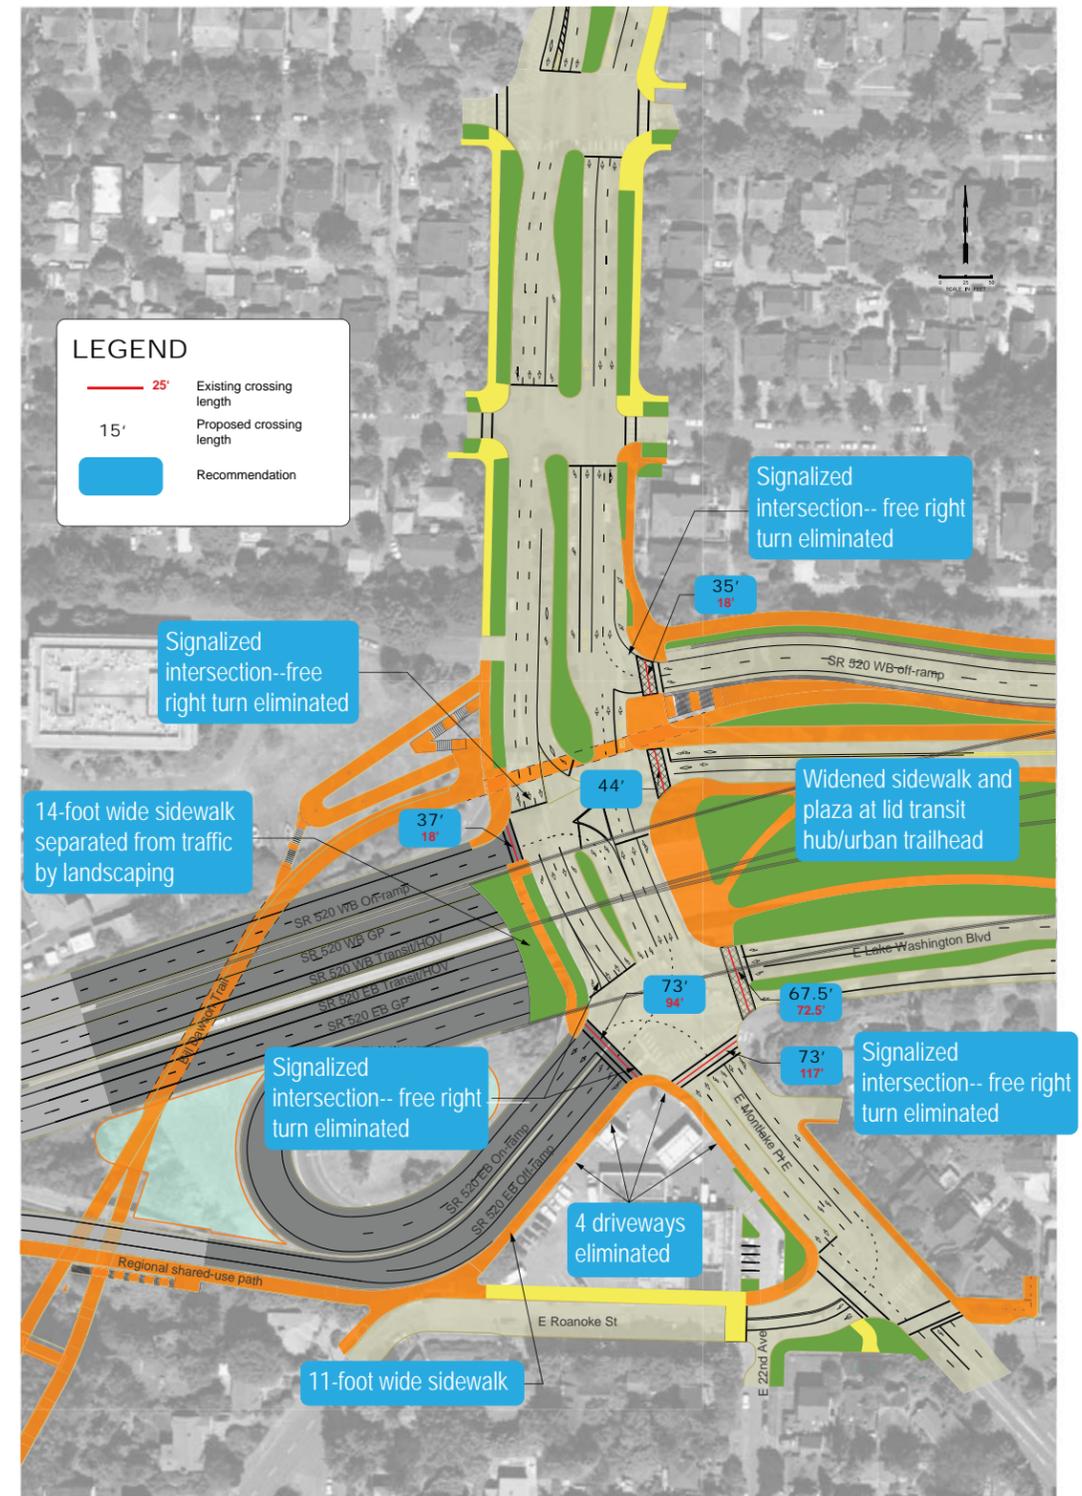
Crossing improvements at Montlake Boulevard East and East Lake Washington Boulevard
